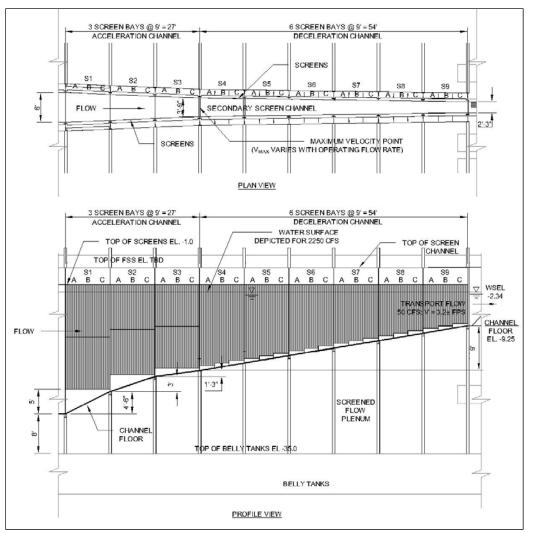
Secondary Screen Channel, Plan & Profile (elevations relative to reservoir)
